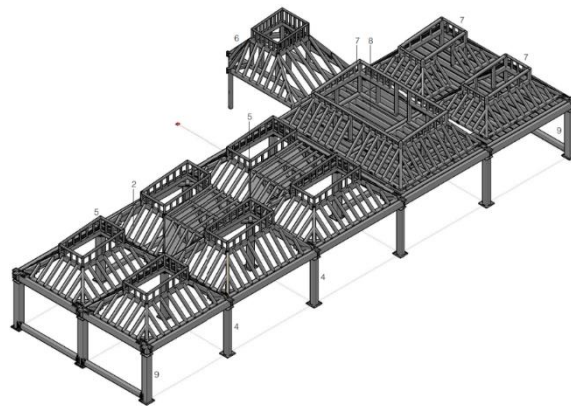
3D model of the oak-framed rooftop extension to The Department Store, Brixton. (© Carpenter Oak).
